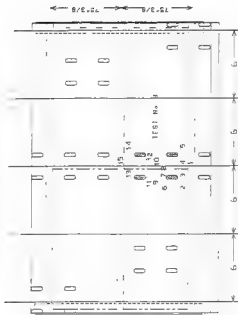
LVDT Locations (Second Bridge - Test No 3)
